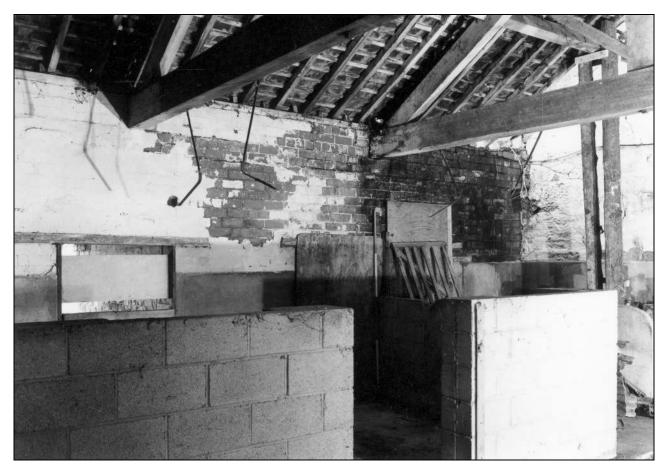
Interior of cow house, from the south-east (film 3, frame 4)
